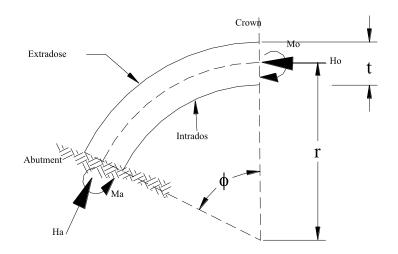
Constant thickness circular arch, fixed at abutments.
